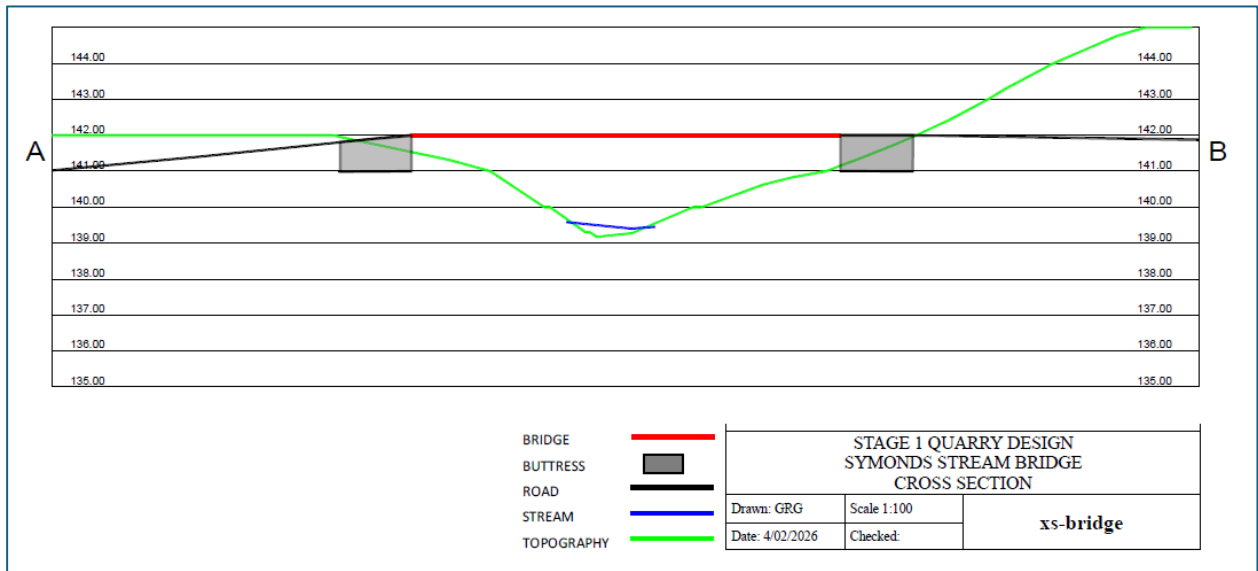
Bridge Cross Section A–B Showing Deck Level, Abutments, and Stream Profile
